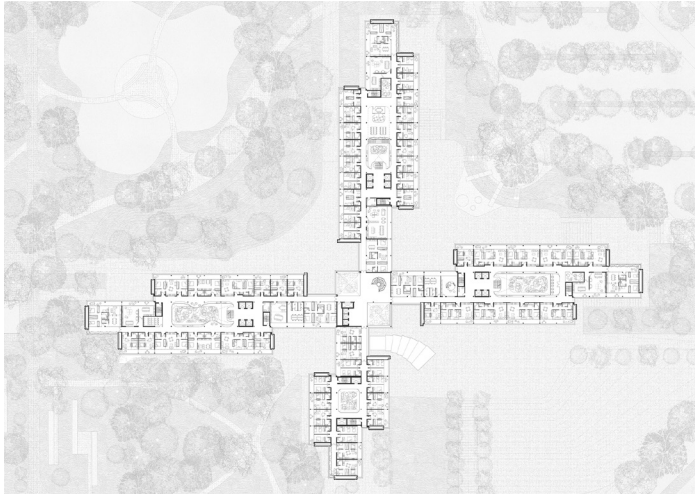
Level 2, typical floor (Tafaro & Farahbod 2025).
